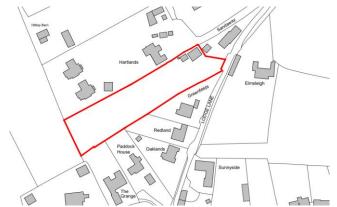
Location plan for approved single dwelling under 0623/21/FUL.
